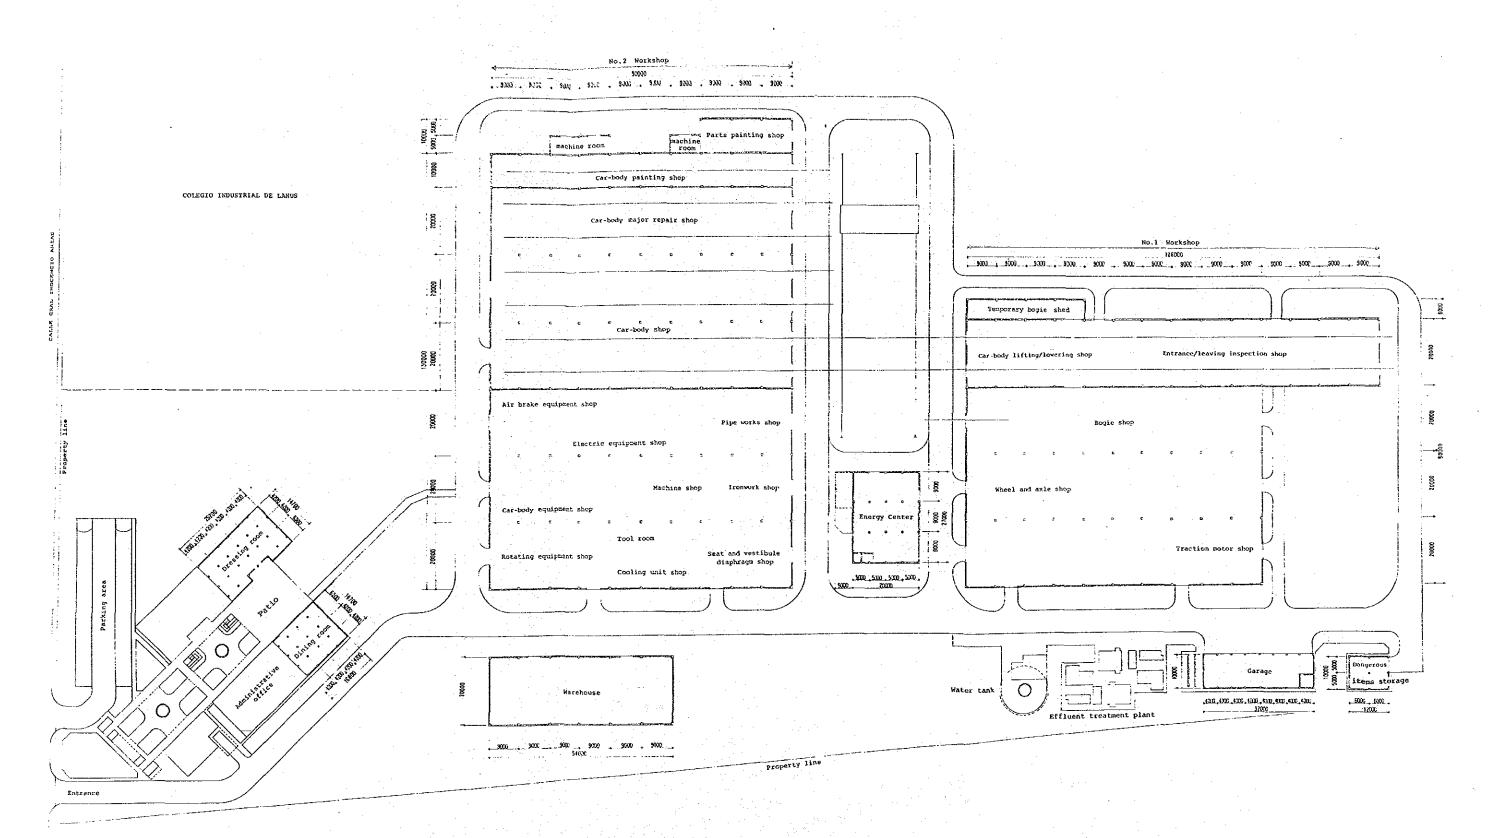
Layout of KM 10 Workshop Buildings Proposal Ib, II
